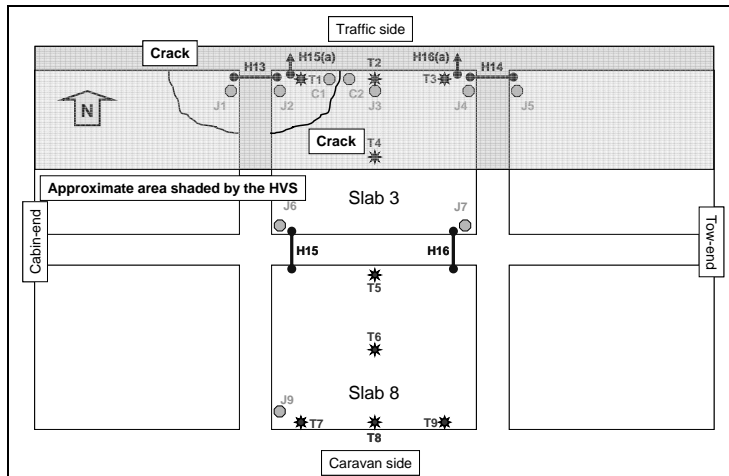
Dimensions, test sections layout, and HVS during load testing
